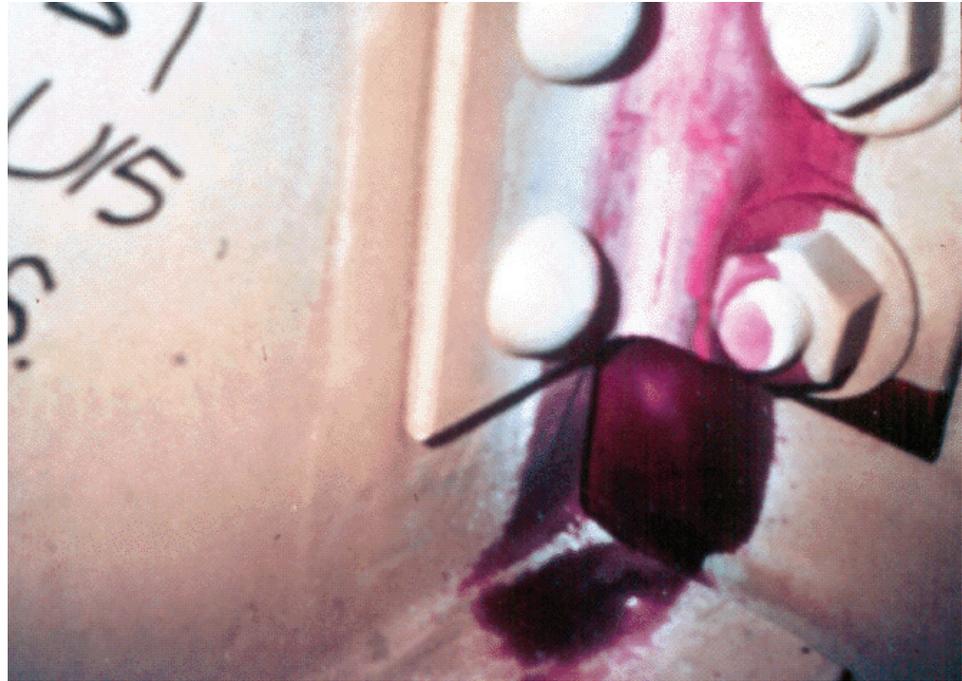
Detection of a Crack Using Dye Penetrant
